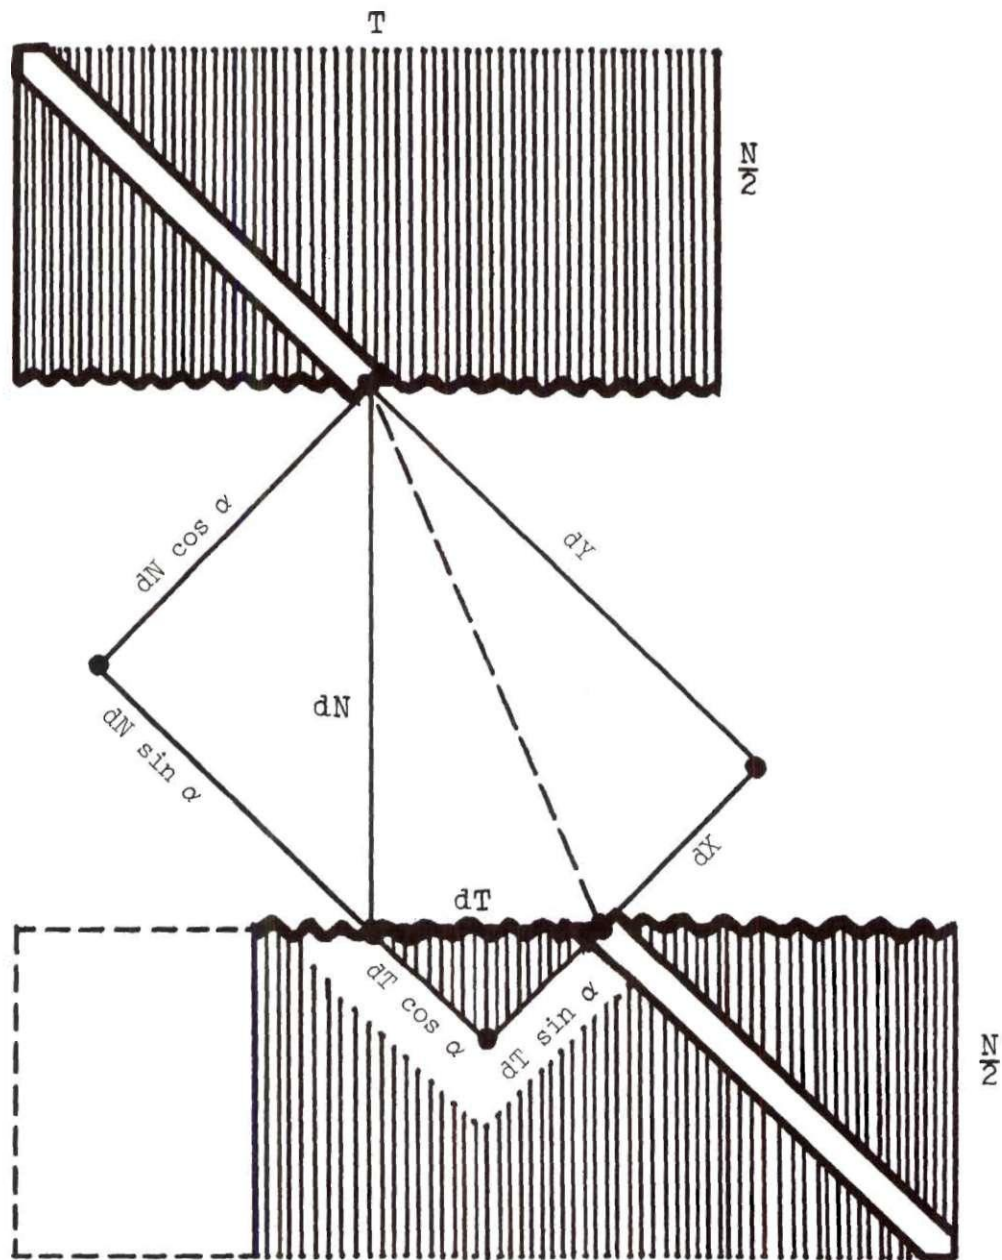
Geometry of Deformation for Reinforcing Bar Crossing an Opening Crack.
